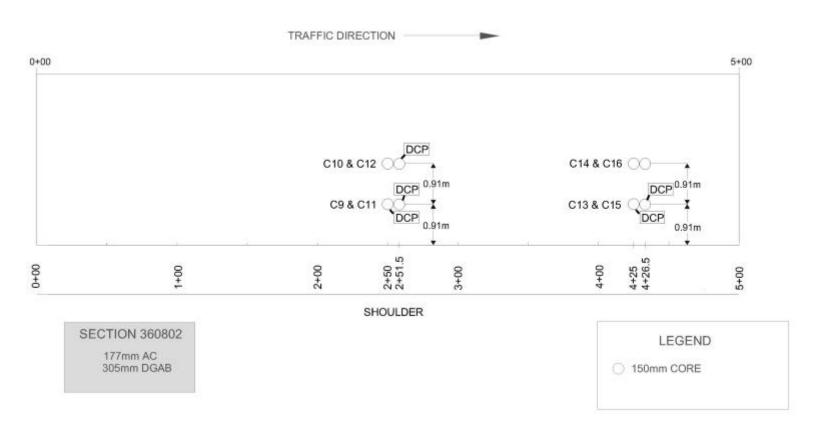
Layout of Sampling and Test Locations (October 7, 2008)
